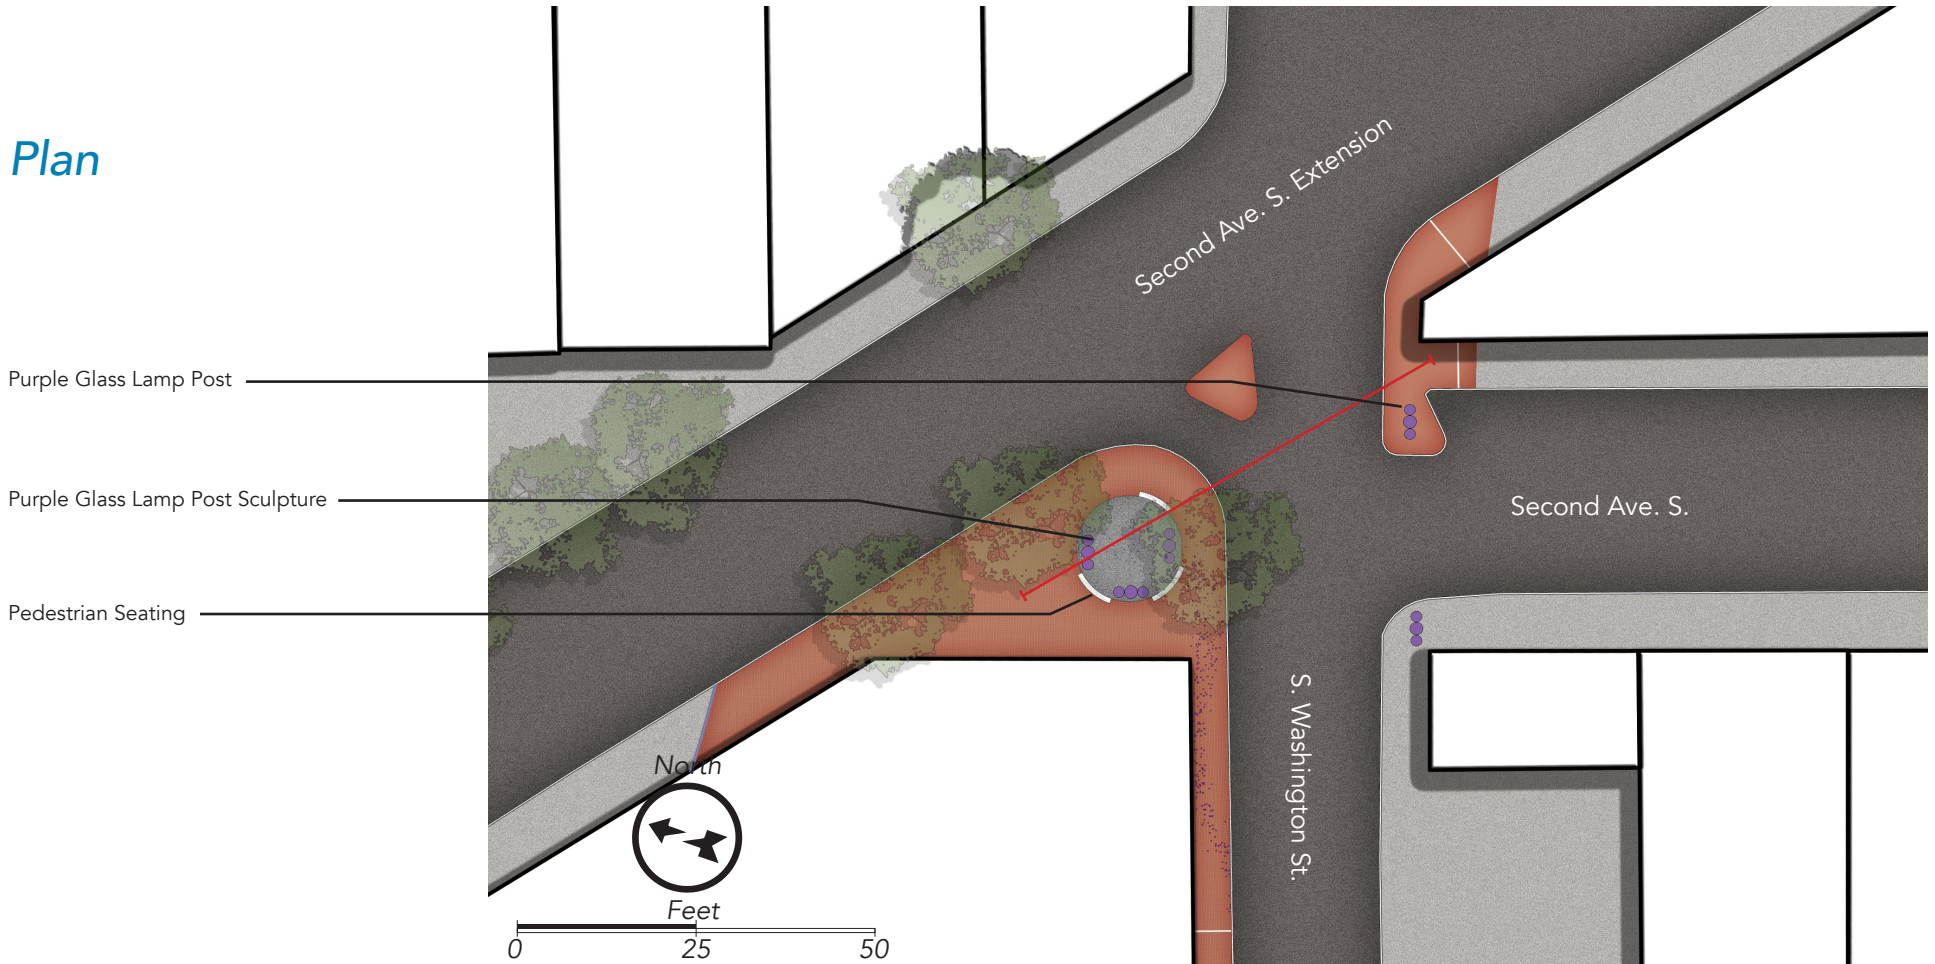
The Gateway on 2nd Avenue Site Plan
